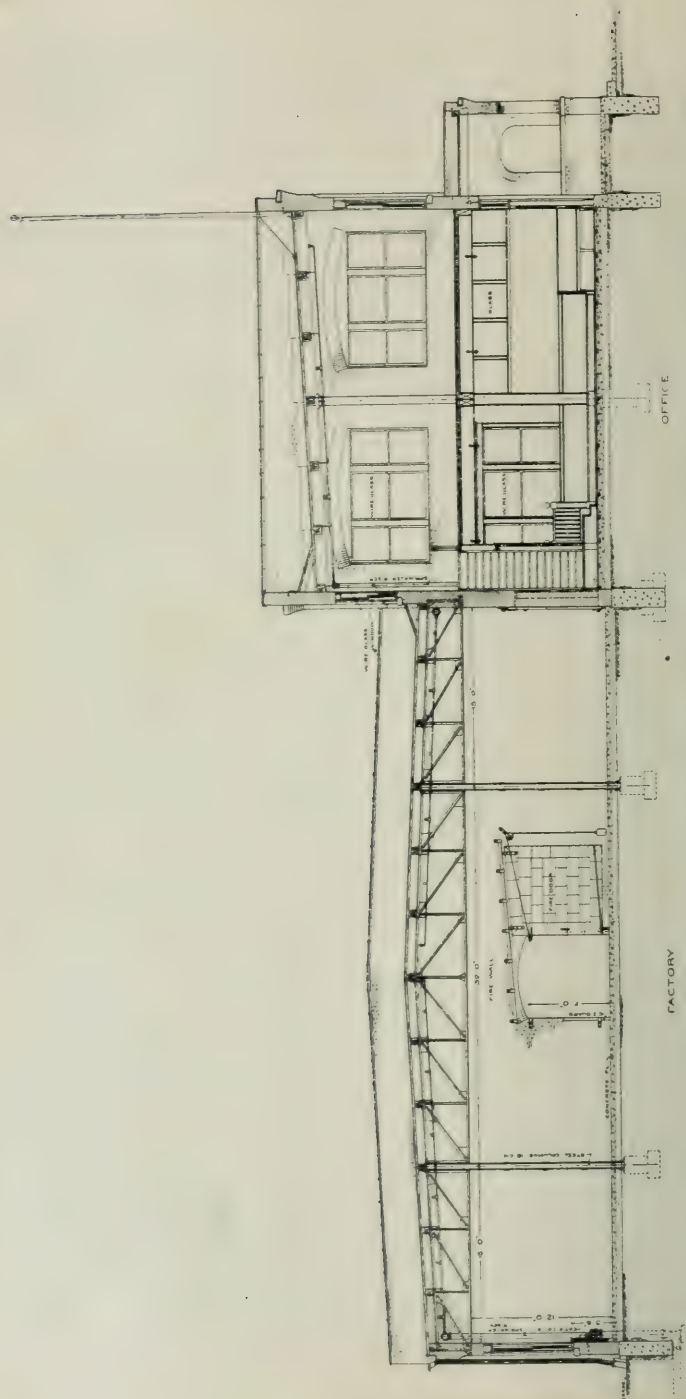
Sectional Views of One Story Factory for Manufacture of Metal Refrigerators.
